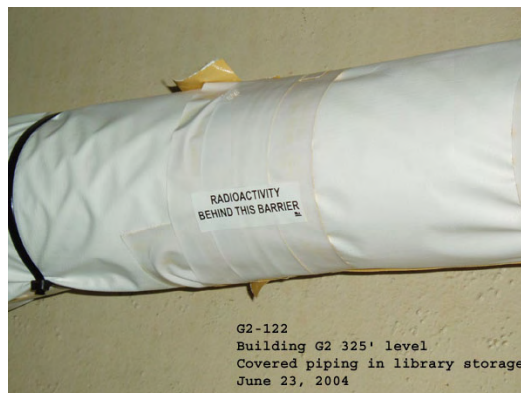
Photo G2-122, 325-Foot Level Library Storage Covered Piping, 2004
